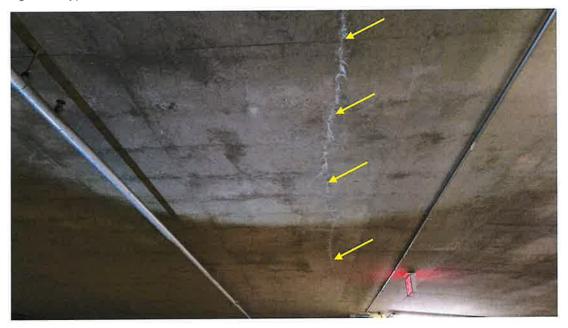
Typical Shrinkage Cracks at Underside of 1st Level. Note Efflorescence Emanating from Cracks
